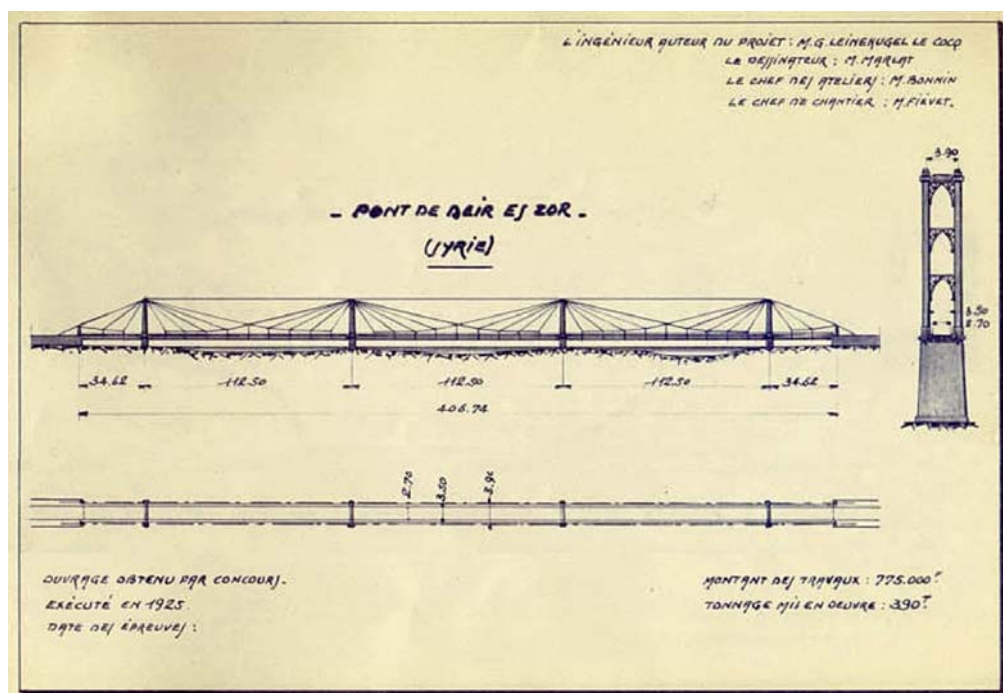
The plan and section of the cable-stayed suspension bridge of Deir ez-Zor according to the Gisclard system.
